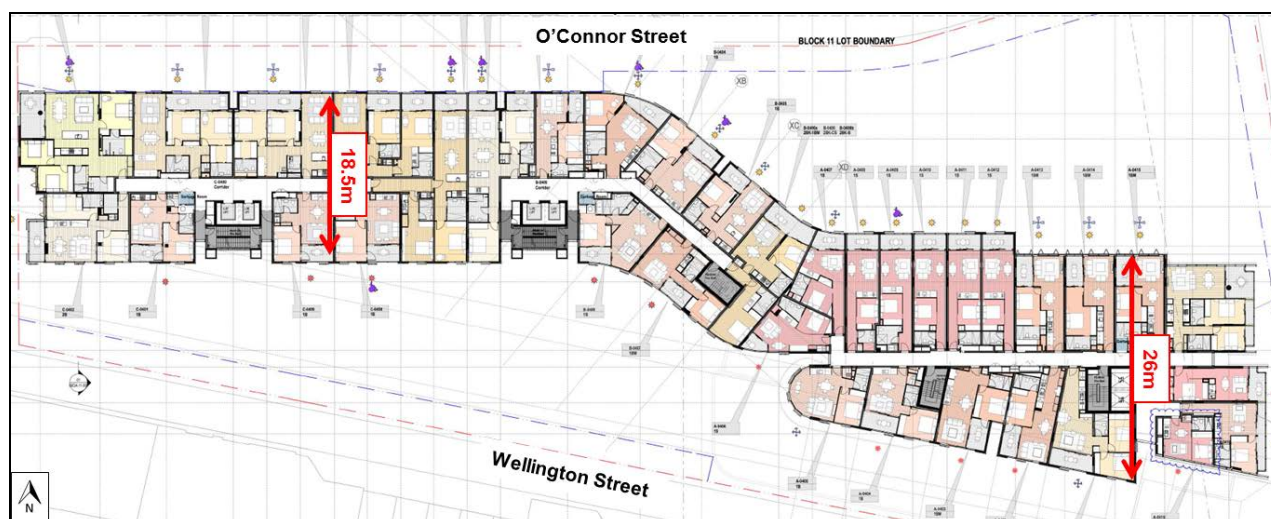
Typical floor layout and building depth (Base source: applicant's RtS)
